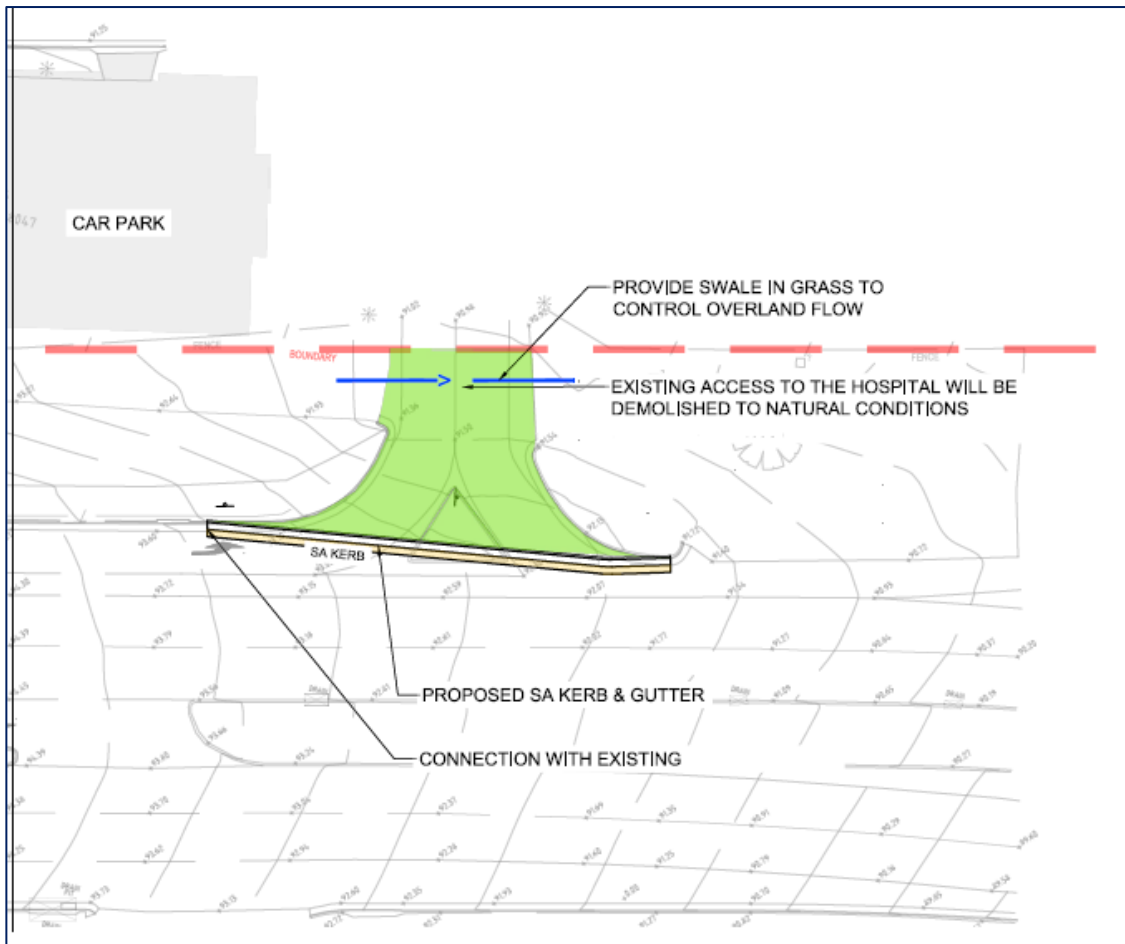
| Proposed removal of existing hospital access (Source: Enstruct Traffic Design Report)
